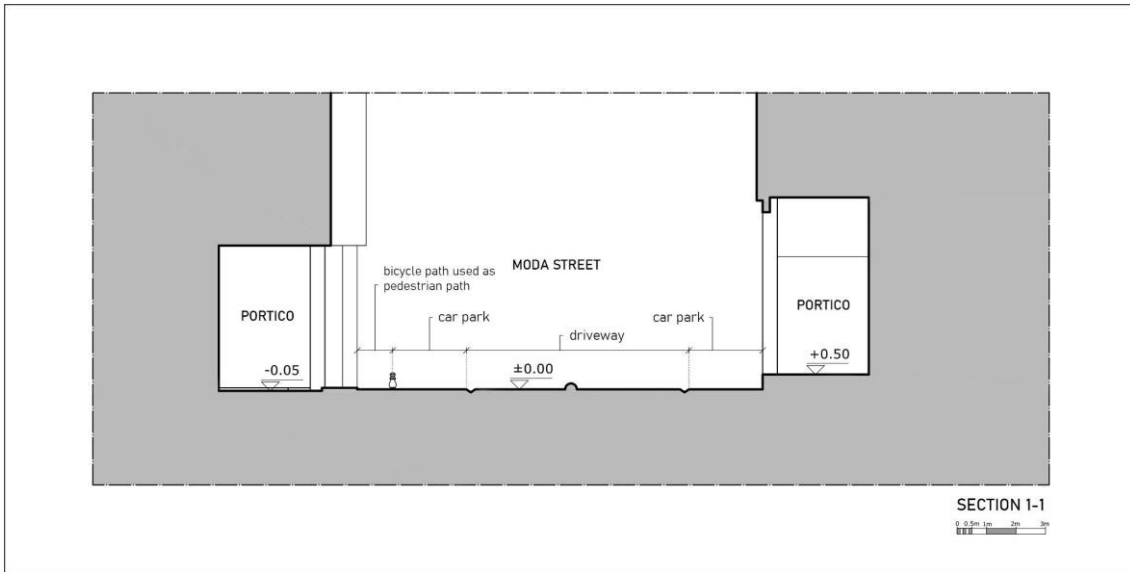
The portico section's detail in Kadıköy, Moda Street¹⁰
